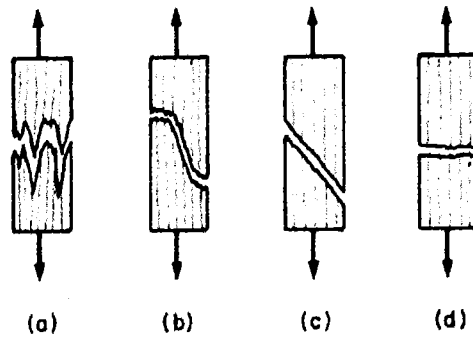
Fracture morphology (a) splintering tension, (b) combined tension and shear, (c) shear, (d) brittle tension [5]
